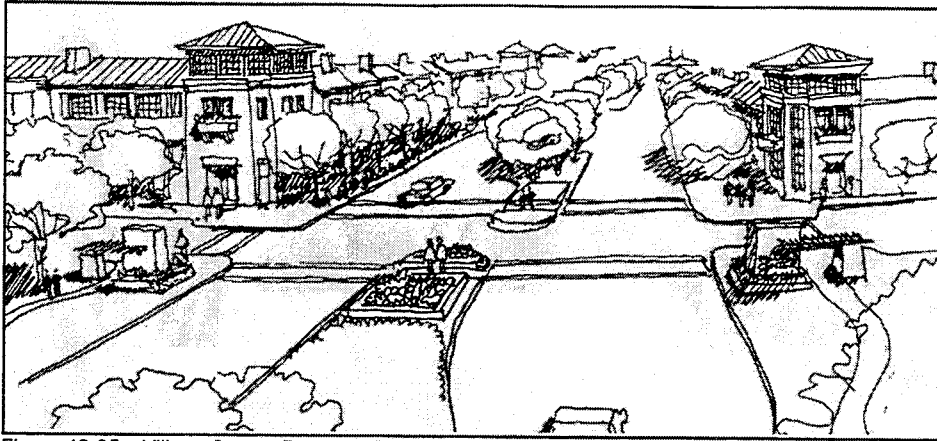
Village Center Entrance Gateway Design Concept - Pleasant Grove Boulevard
